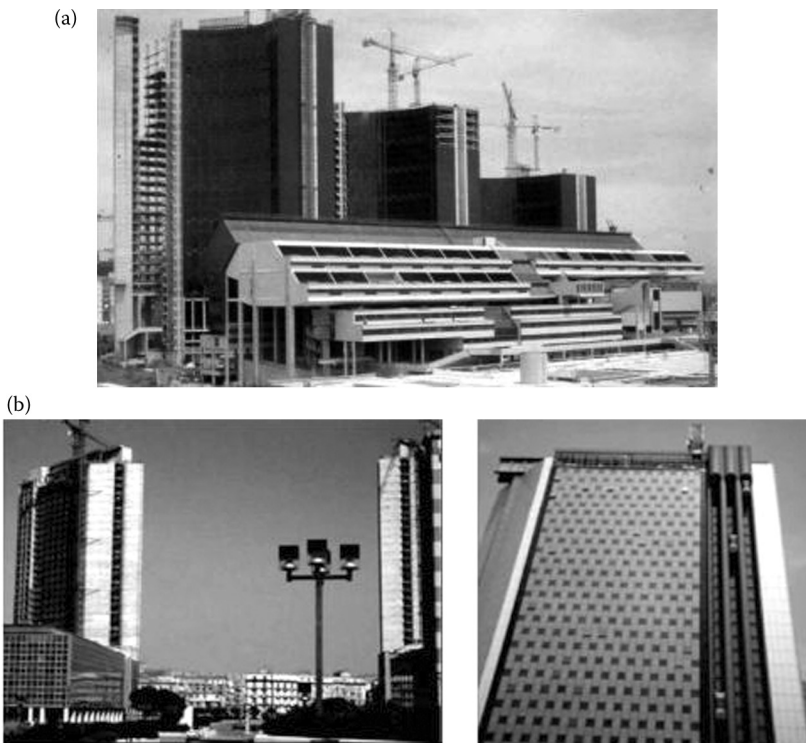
Mixed structures in Naples: (a) low court place; (b) electrical department headquarters.
